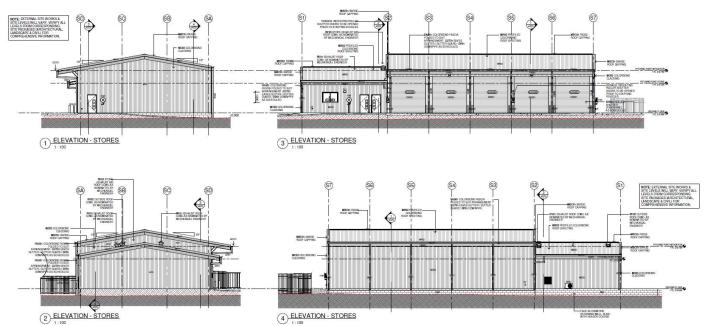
Stores Elevations (NBRS, 28 September 2023)
